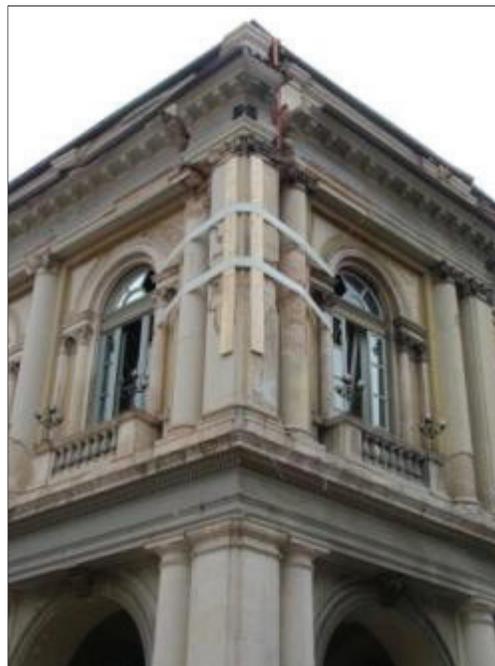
Retrofit intervention of the damaged corner of Quattro Cantoni with hoops
